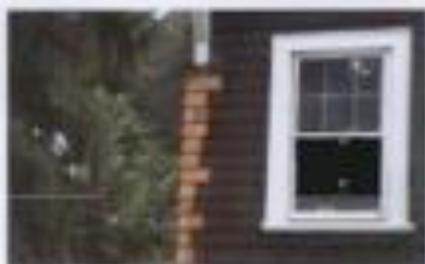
One of the advantages of wood shingles as a wall covering is that individual shingles that are damaged can easily be replaced. On the highly exposed corner, some shingles have been subjected to impact to help understand potential water damage. The new shingle will be placed to match the existing shingles.
